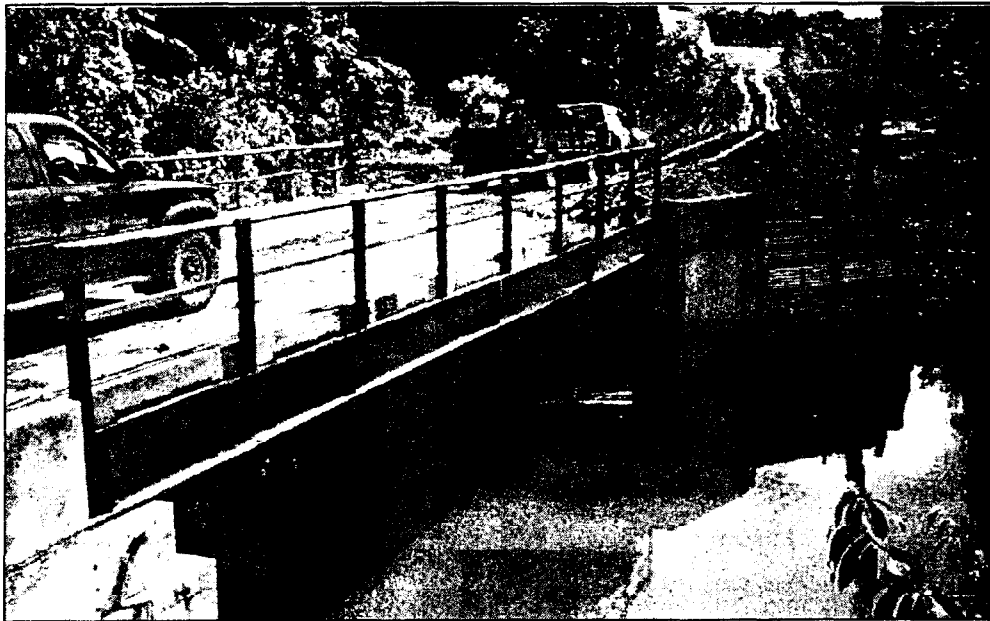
A 46' x 20' bridge constructed as part of a road building project. The tree branches and sheets of galvanized steel (right side) were used to prevent soil erosion because the wing wall was built too short. (Office of Inspector General photograph)
